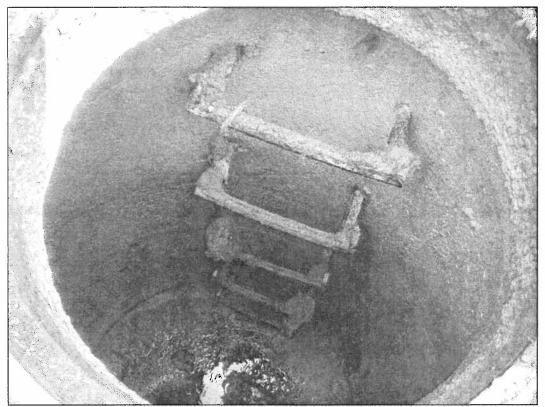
Interior of manhole at N. 19th Ave and Pearl Street. Note debris build-up on the top ladder rung as well as the lower elevated ladder rungs.
